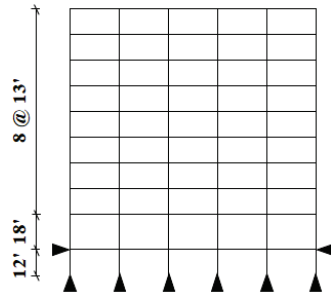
Baseline SDC B_{\max} steel moment frame building typical 9-story elevation.
